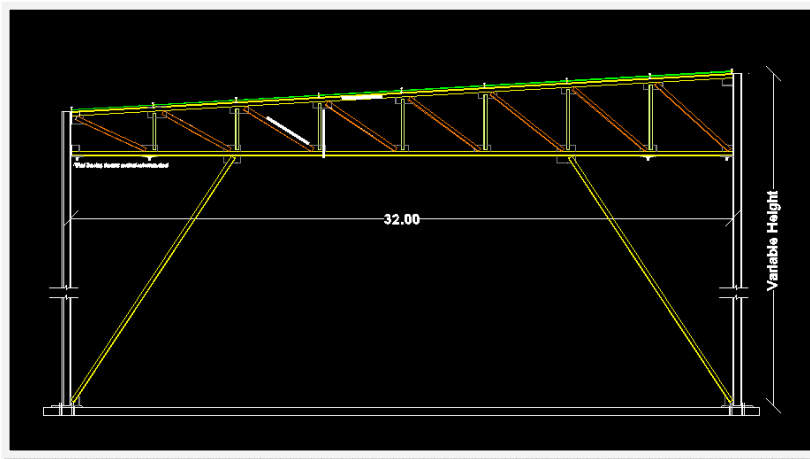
2XL200x200x24 Equal angle steel profiles for transverse bracing
